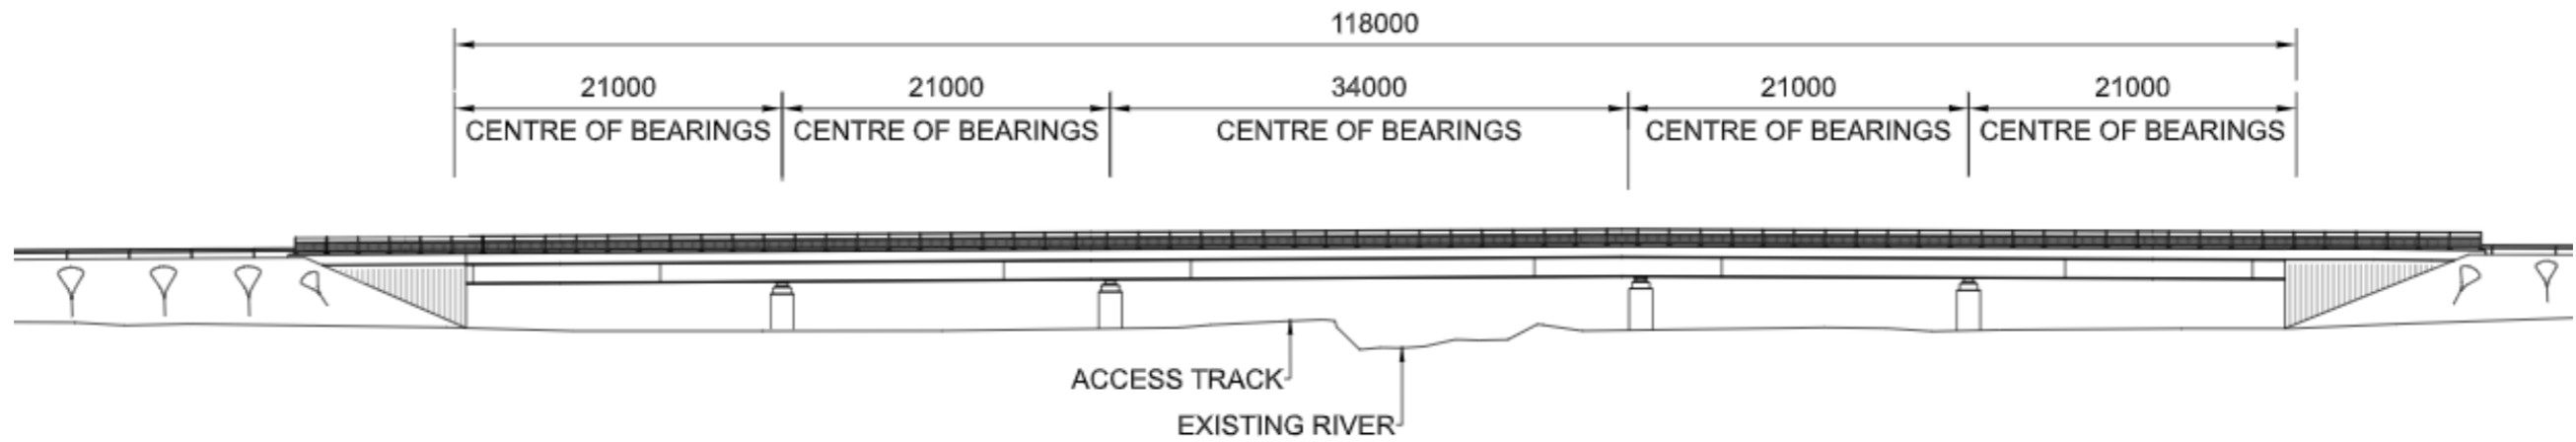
Elevation of the proposed River Granta (Stapleford) crossing viaduct. Numbers are in mm.
